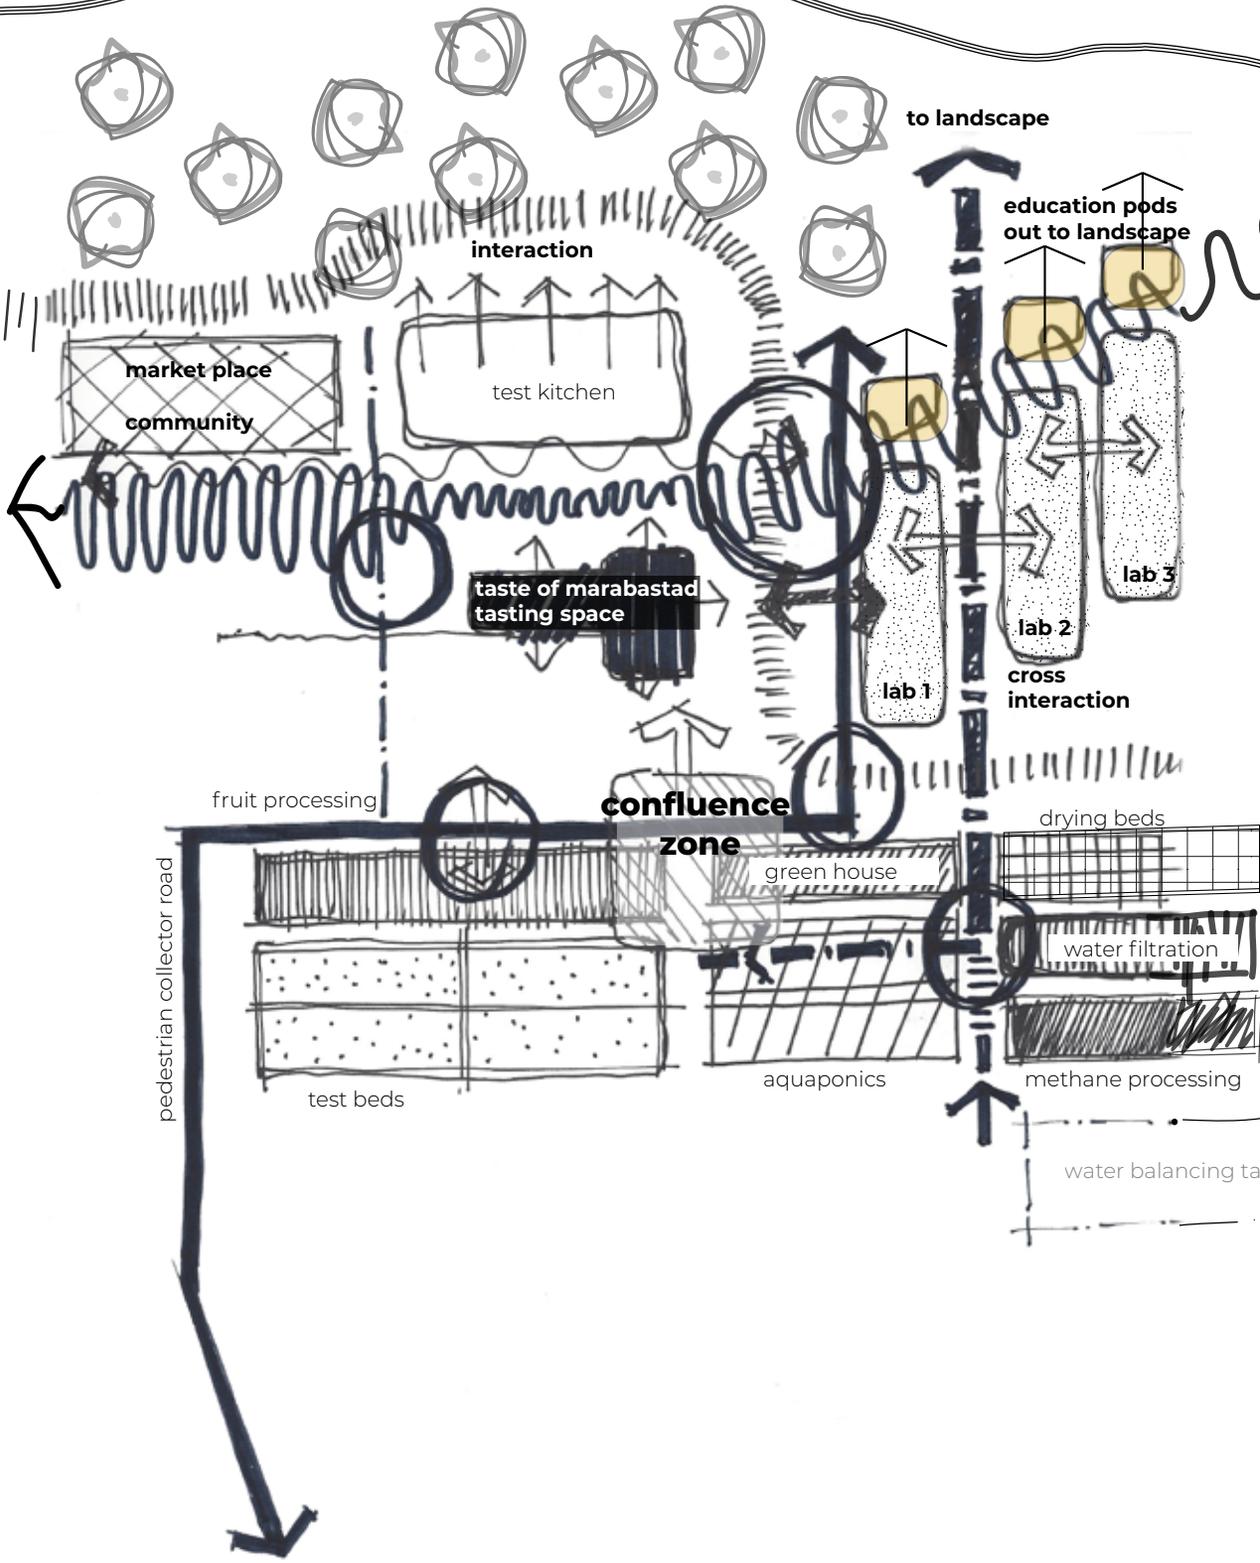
Activated public space surrounding building(Bias Architects, 2018)
